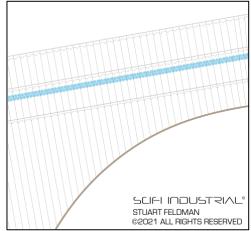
The canopy over parks, E-W section comprises three layers, water bags for shielding, and web cables to provide downward force. (Feldman)
